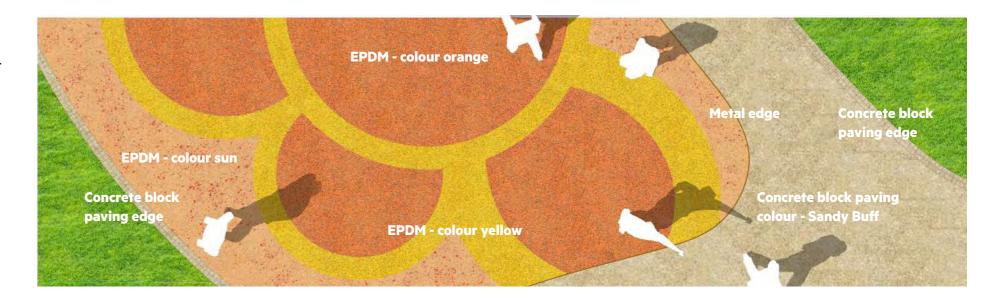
Illustrative Plan showing location of proposed materials within the NEAP play area
